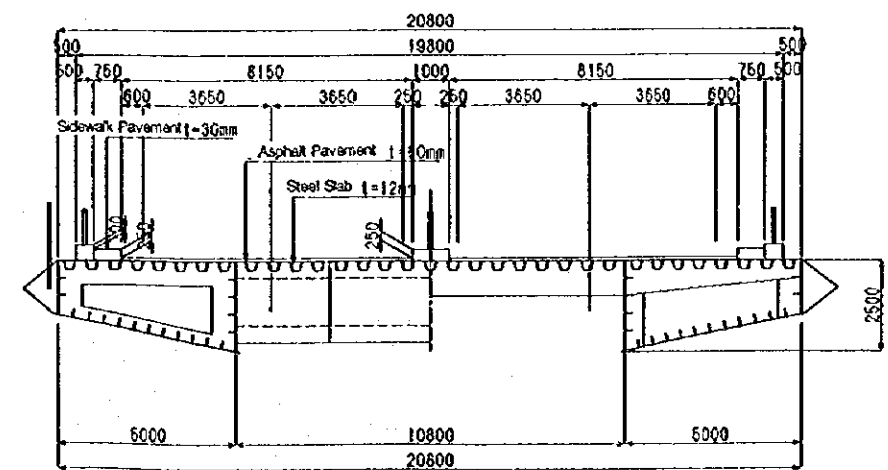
General View (Steel Box Girder Alternative : L=404m)
